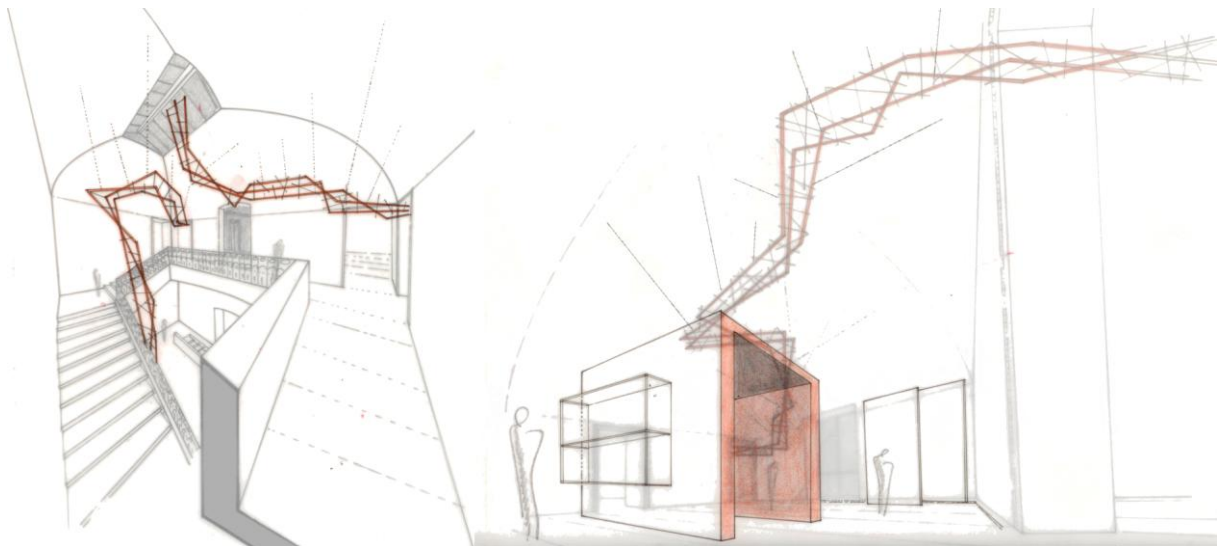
Pontrelli Building, interiors, reticular bean for theater
